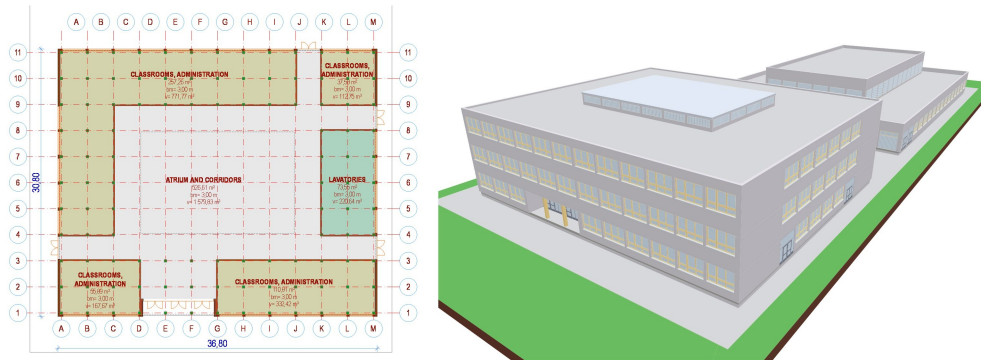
Mátyás Király High School: part of the ground floor and 3D model (school building and the gym)
